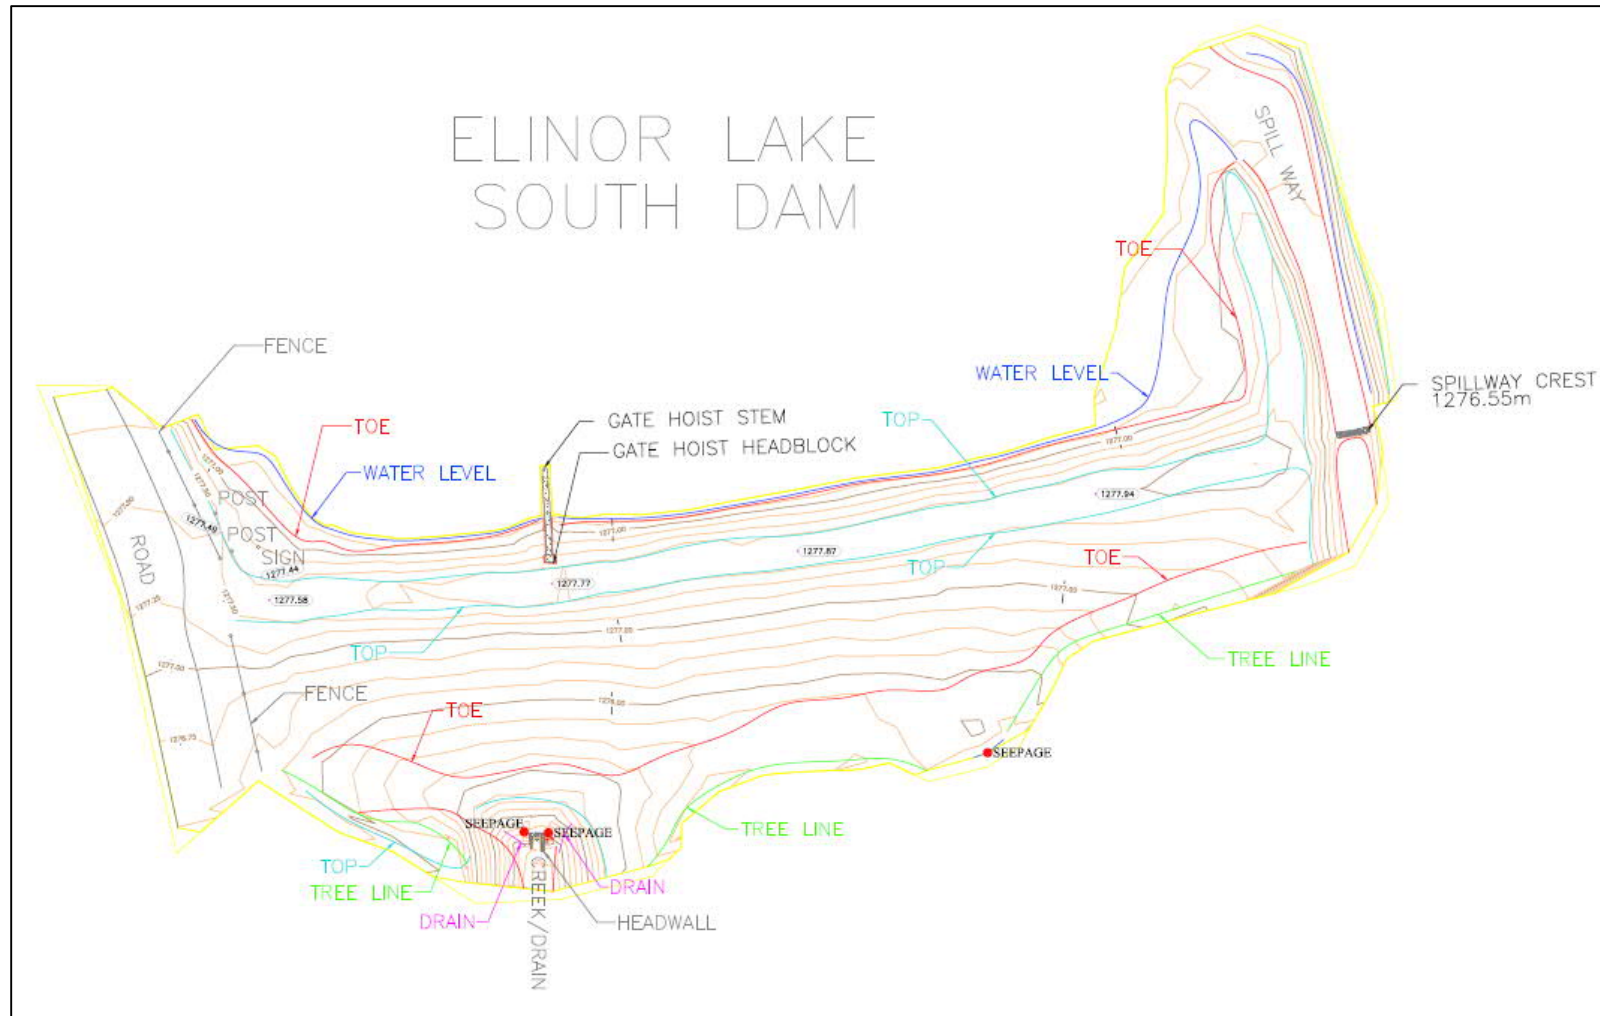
Elinor Lake South Dam Site Plan and Topography (Okanagan Survey, 2012)
